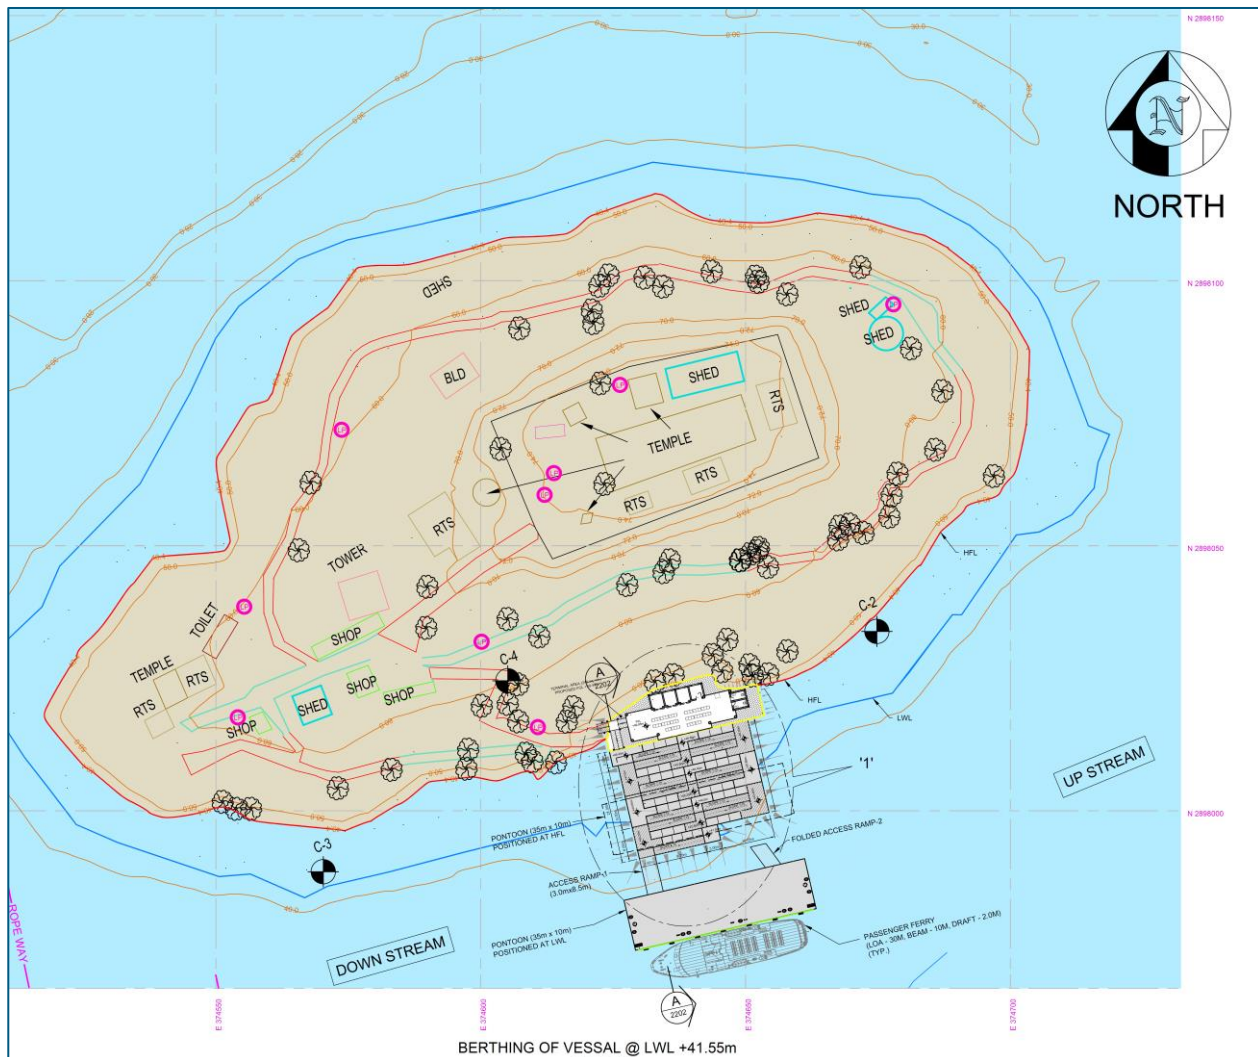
Typical Arrangement of Pontoon, Ramp and Approach Bund
